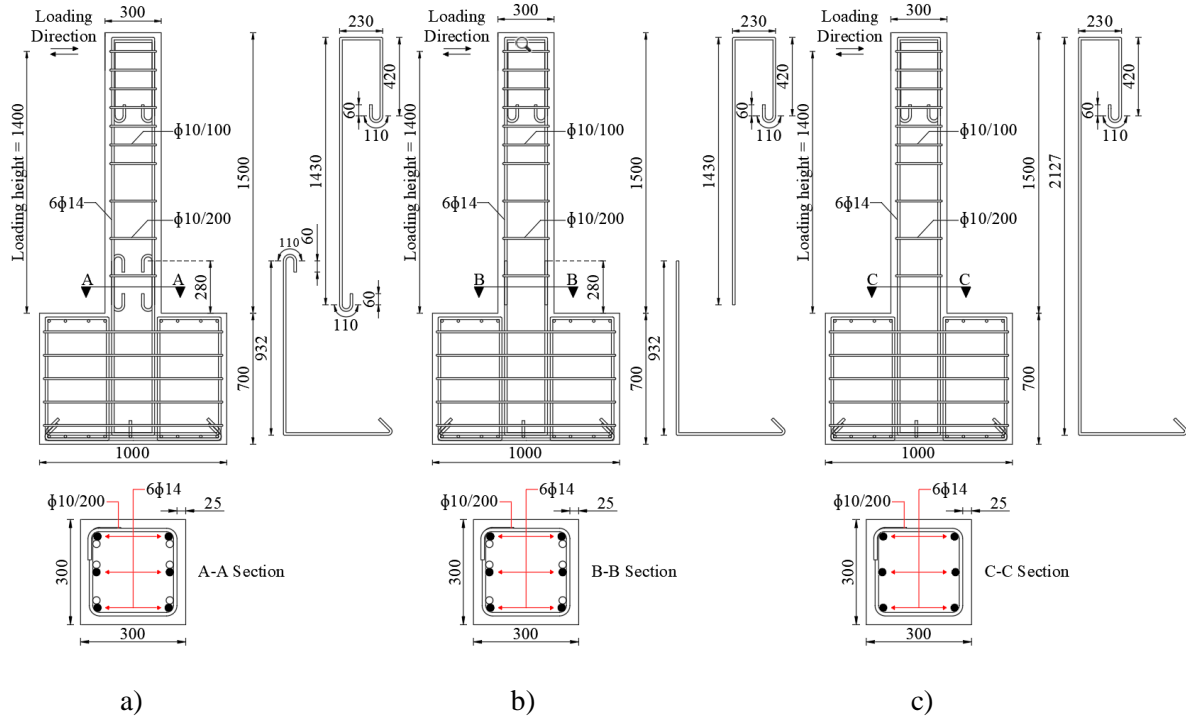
The lap-splice configurations, dimensions and reinforcement details for a) SH, b) SNH and c) SC columns (all dimensions in mm)
